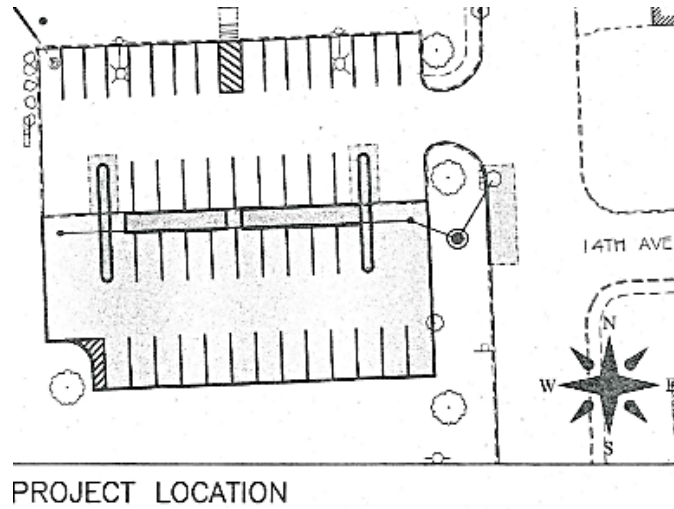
Location of the sensor installation at Finch parking at the northwest corner of the new porous asphalt area
